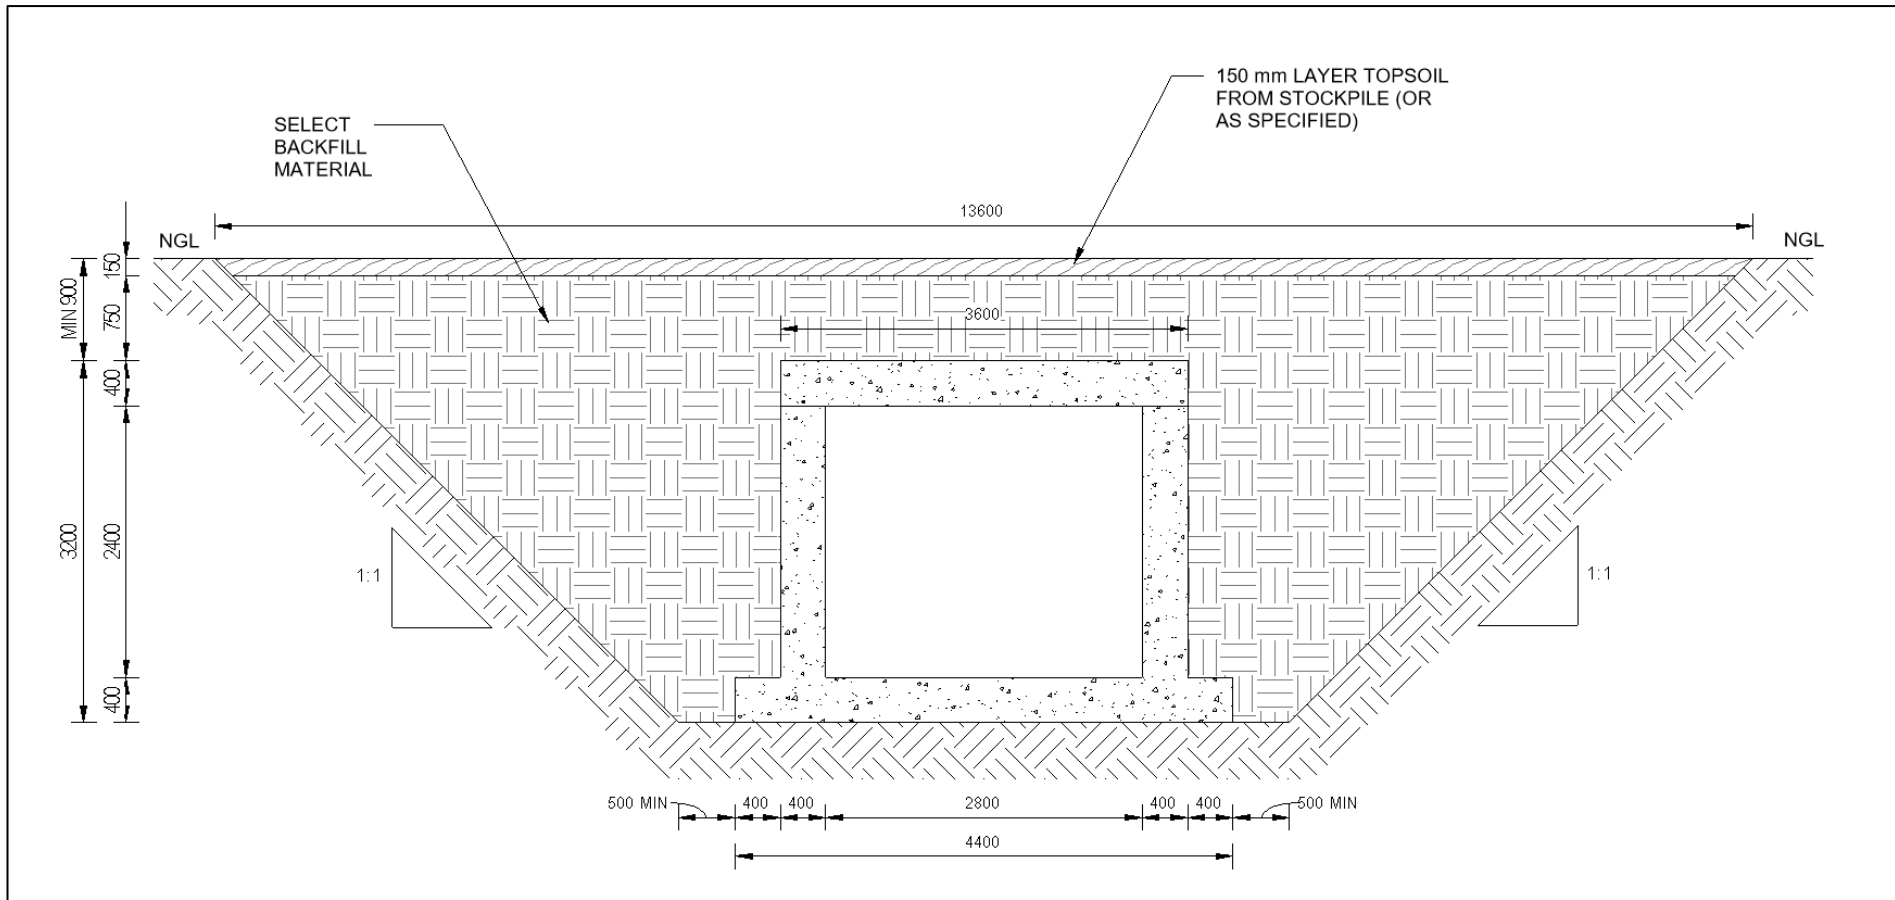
Typical cross section of Siphon 2 - rectangular portal culvert
